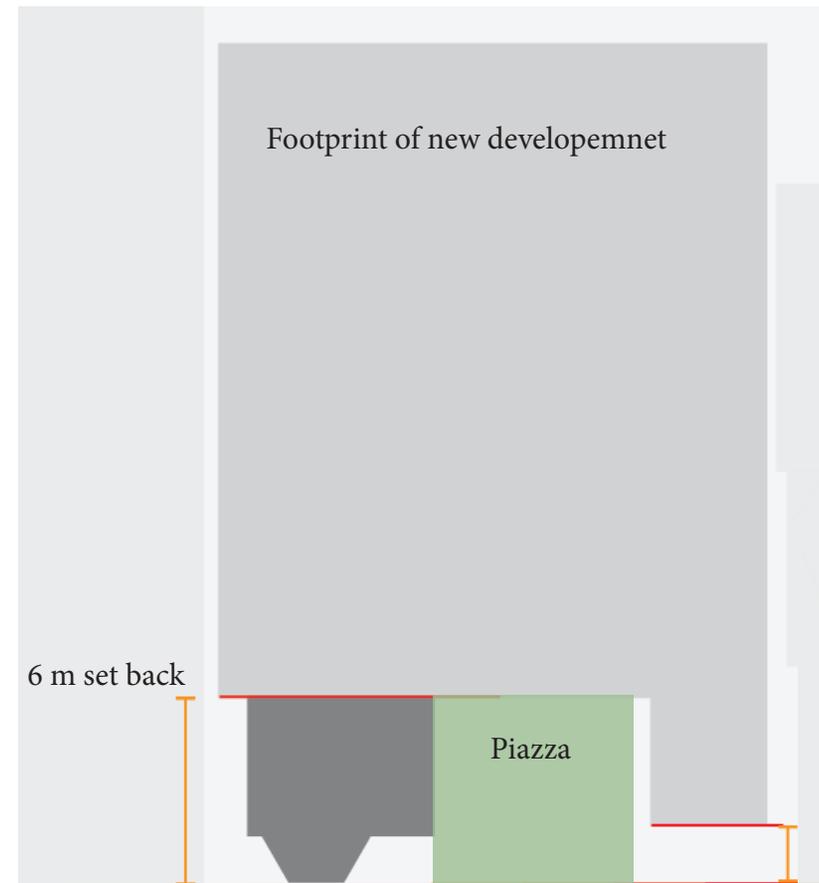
Showing 6 meters setback, Open Mic House, and piazza in green.
